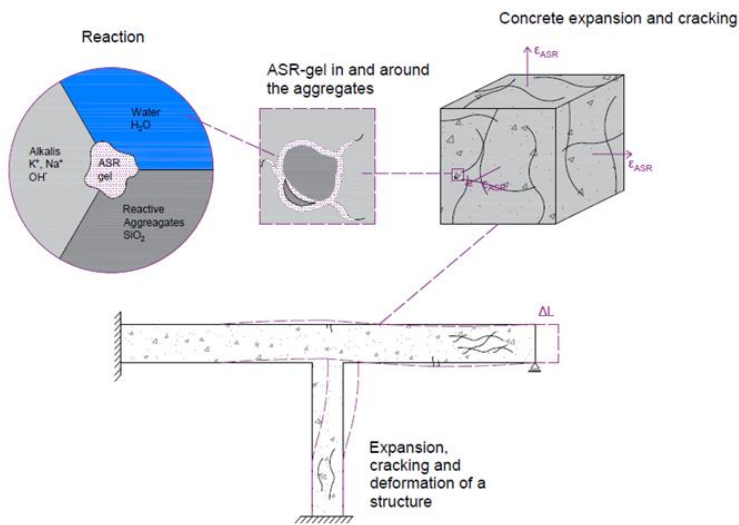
Damage mechanism of ASR, from the reaction to the expansion, cracking and deformation of a concrete structure
